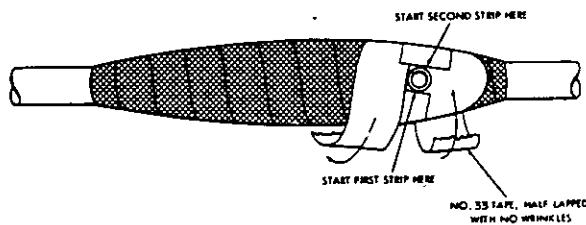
Pressure Splice, Attaching Injection Fitting.
